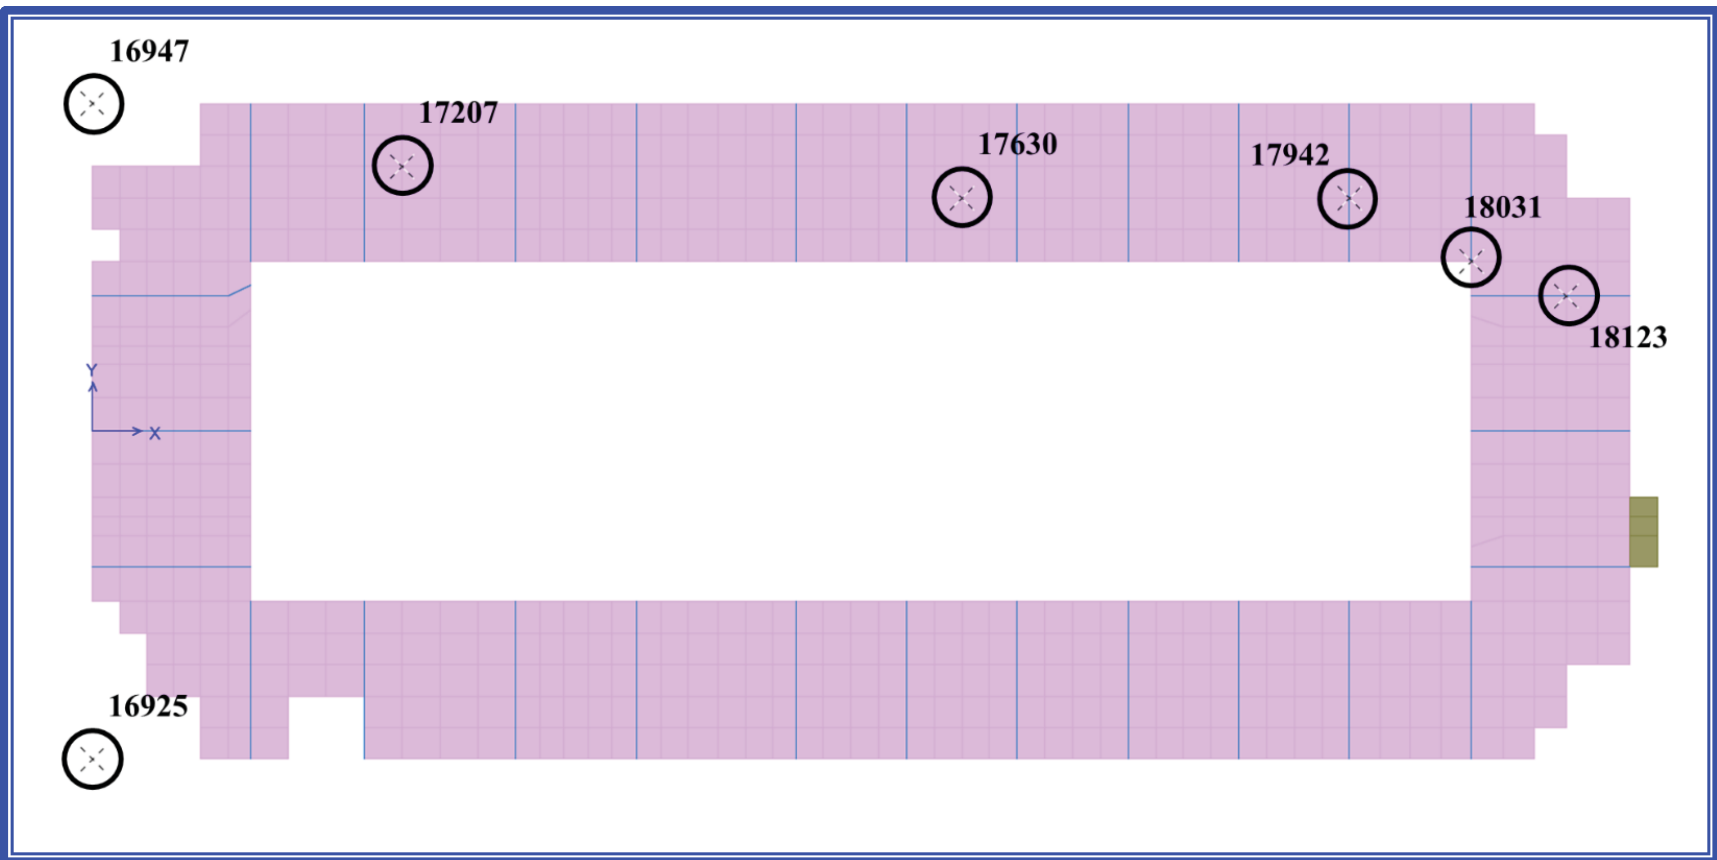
Floor ISRS Locations at TOC EL 100'-0"
